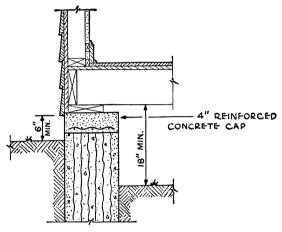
A reinforced poured-concrete cap on masonry walls or piers, preventing hidden attack by termites. This cap should be at least 4 inches thick and must be poured in one continuous operation so as to avoid joints. Minmum clearance of 18 inches under the building and 6 inches outside will allow inspection for the presence of termite tubes or for possible cracking of the cap.
